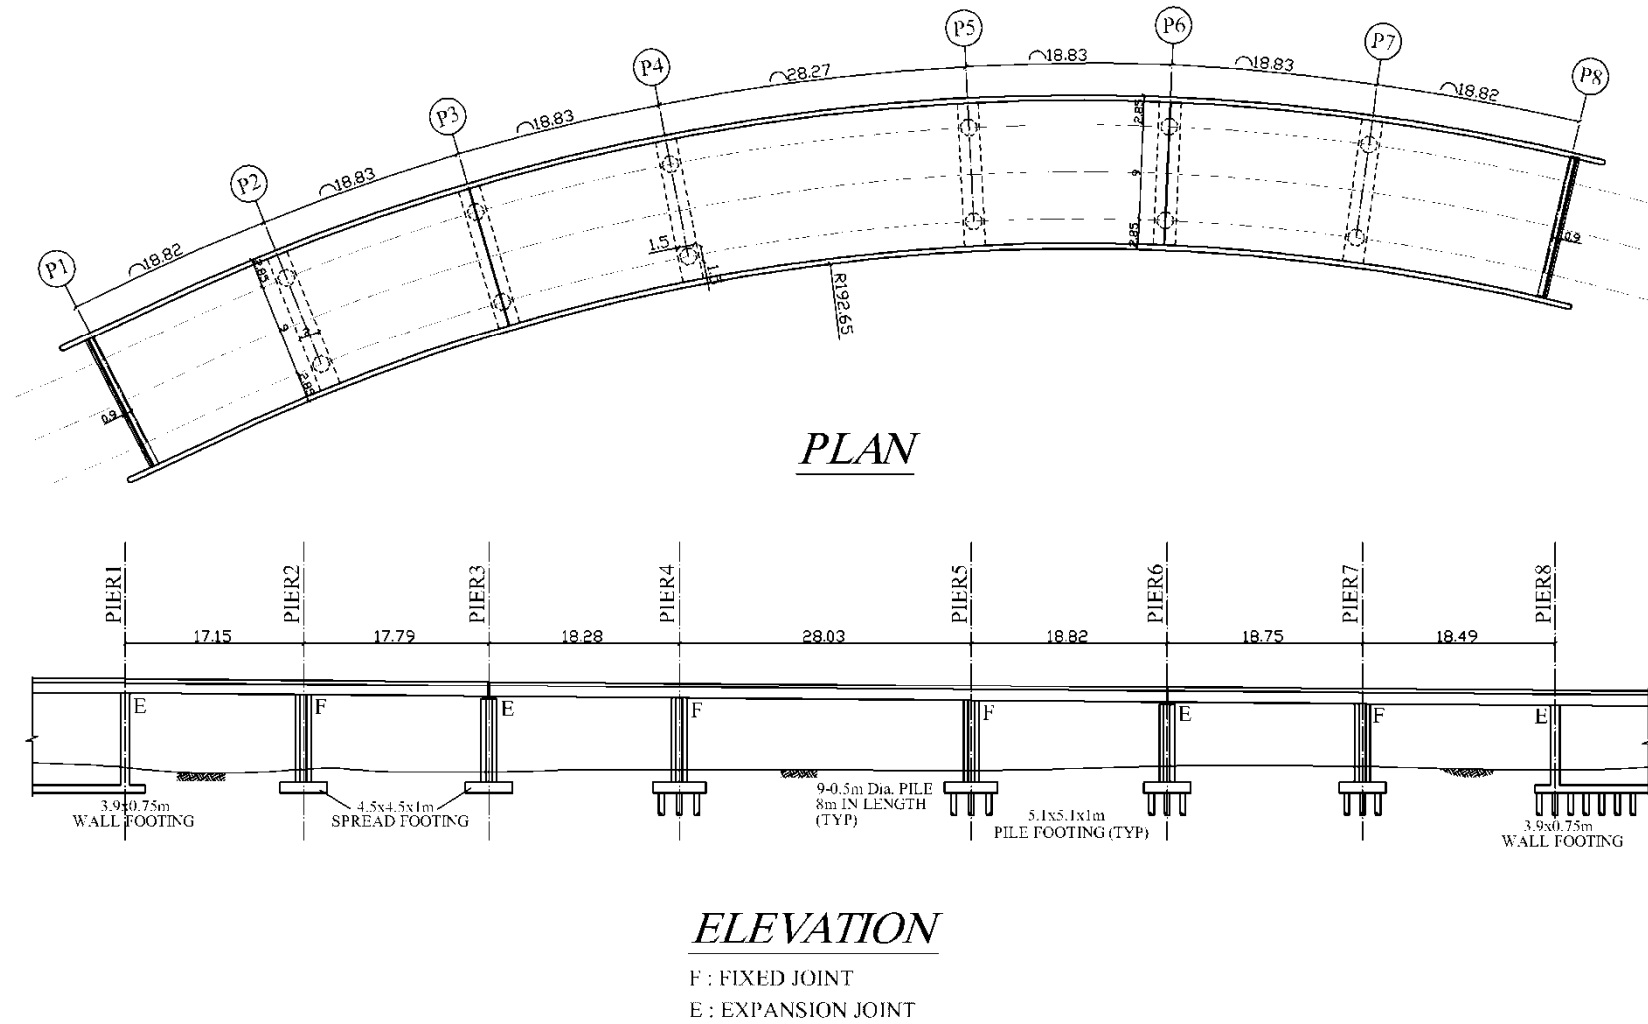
Alnasha Bridge - plan & elevation, dimensions in meter (Adapted from Greater Amman Municipality).
